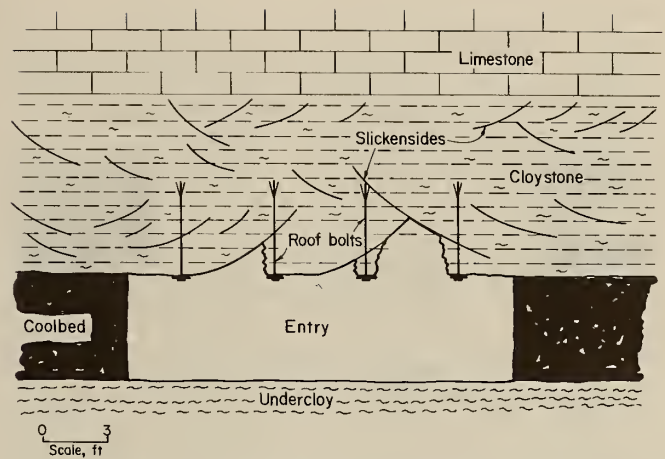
Subtype G₄ roof failure attributed to slickensides.
